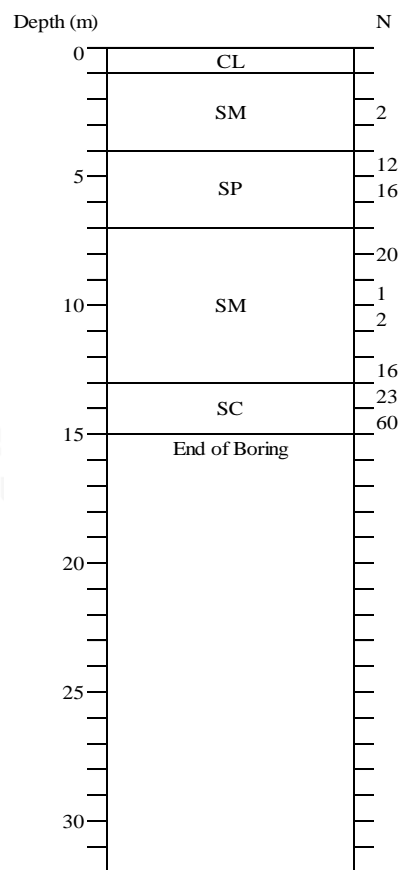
Subsoil profile at Suratthani (Department of Public Works and Town & Country Planning, 1985)
